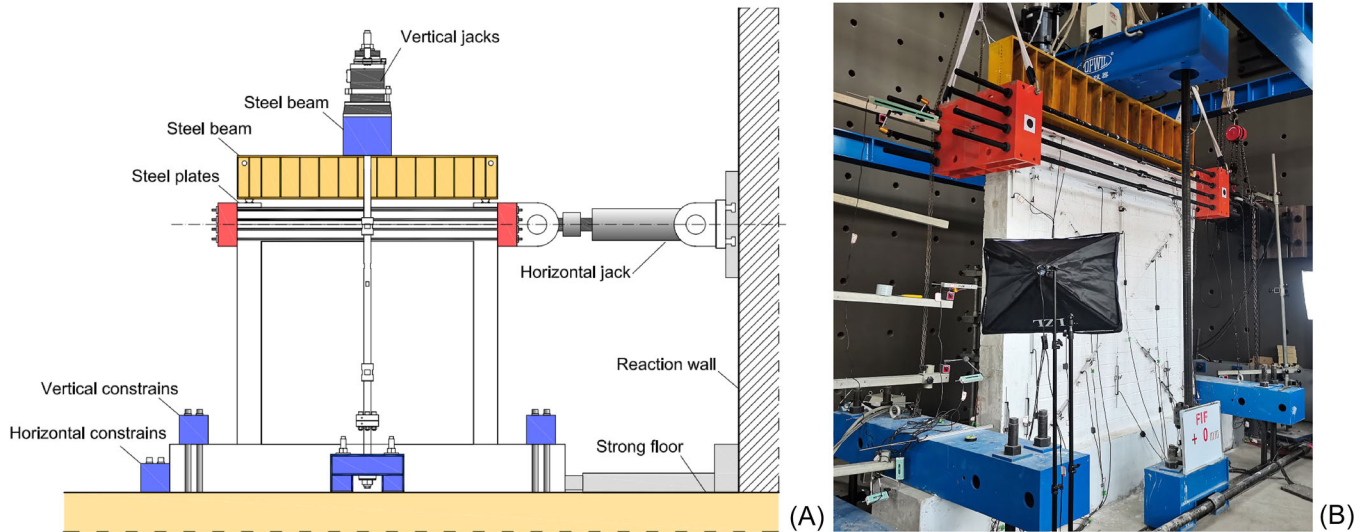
Test setup and instrumentation: (A) scheme of the test setup; (B) view of a specimen in the testing apparatus.
